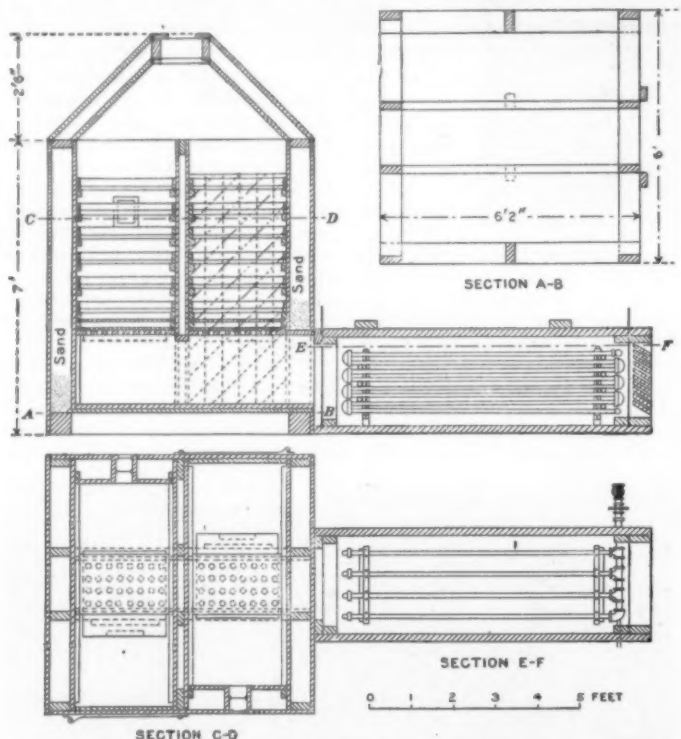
THAW HOUSE FOR FROZEN EXPLOSIVES; SECTION.
